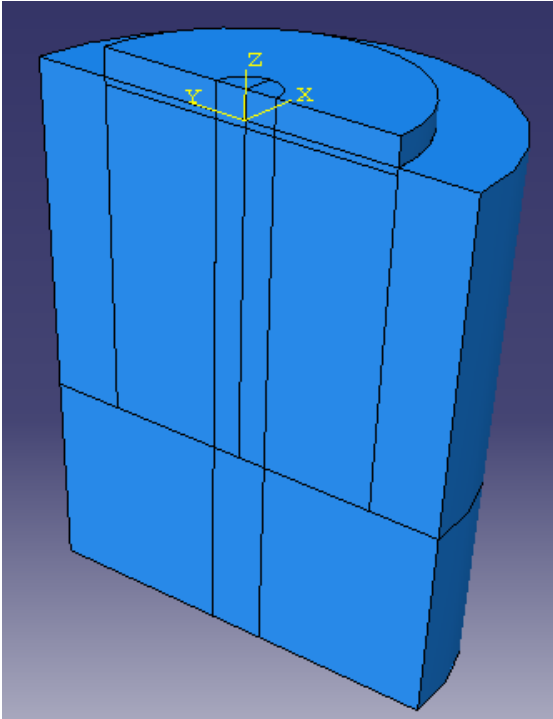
The location of the datum coordinate system on the piled footing structures
